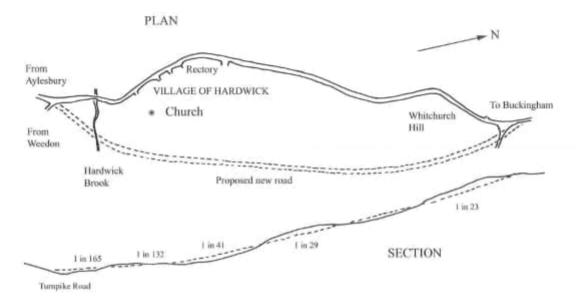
Simplified version of Coolings alternative plan of a new road skirting the rear of Hardwick church. 1836. (BRO, T3/55/2)
